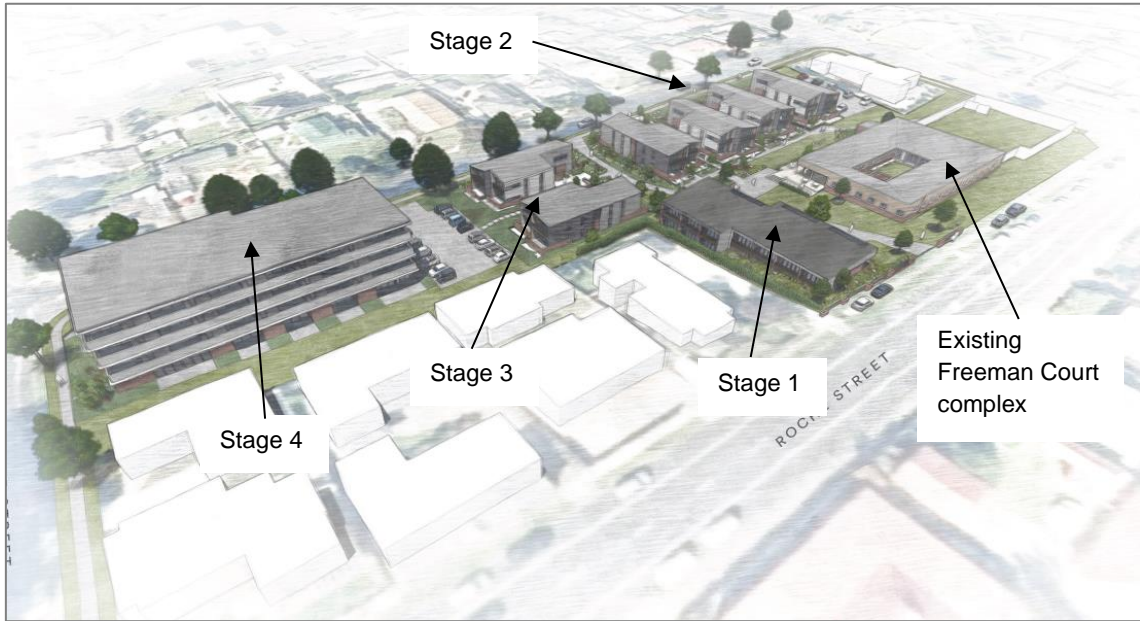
Site plan shown from the corner of Vaile and Roche Street.
